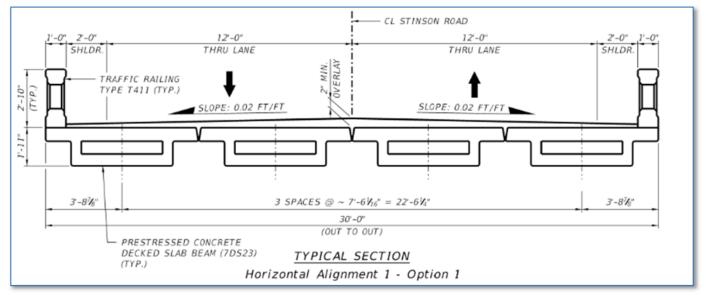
TxDOT Prestressed Concrete Decked Slab Beams (7SB23) Typical Section
